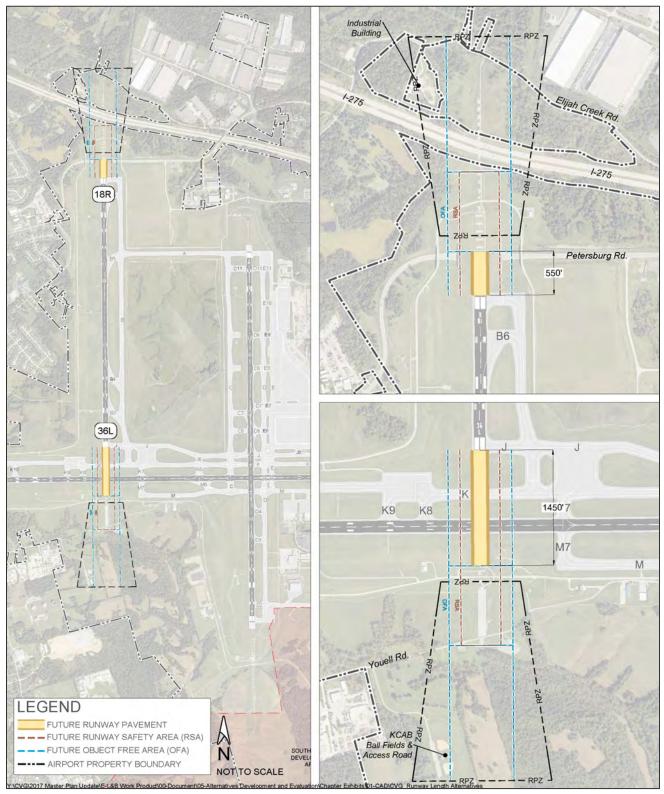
10,000 FOOT RUNWAY 18R/36L – ALTERNATIVE 11
